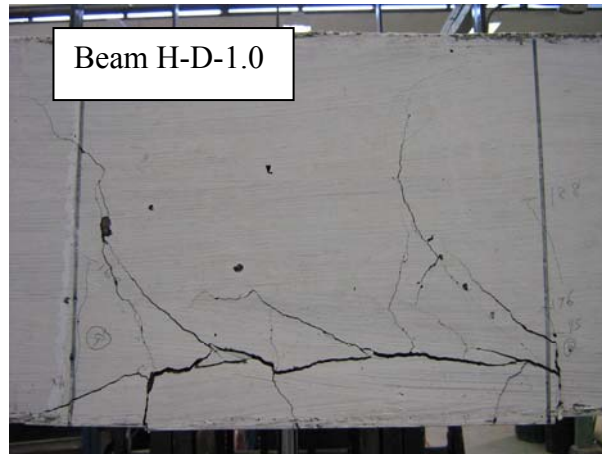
Crack Pattern of High Strength Geopolymer Concrete Beams over the Splice Region After Failure (D-Series)
